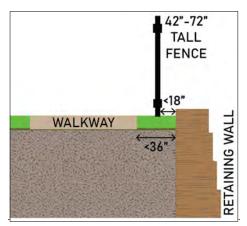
A-2-E-1: Requirement for fence when retaining wall is adjacent to walkway.
